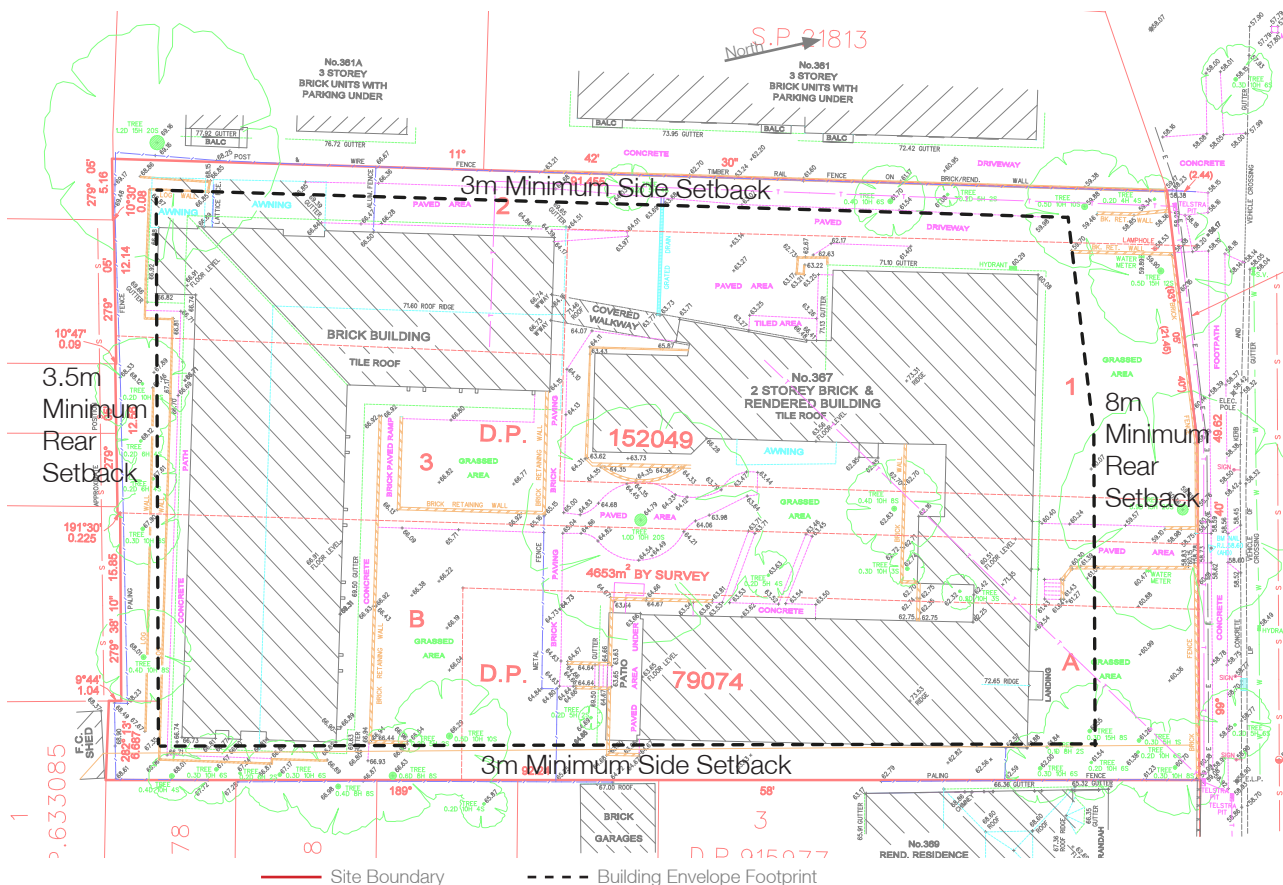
Survey Plan (Rygate & Company 2008) with building envelope overlay
